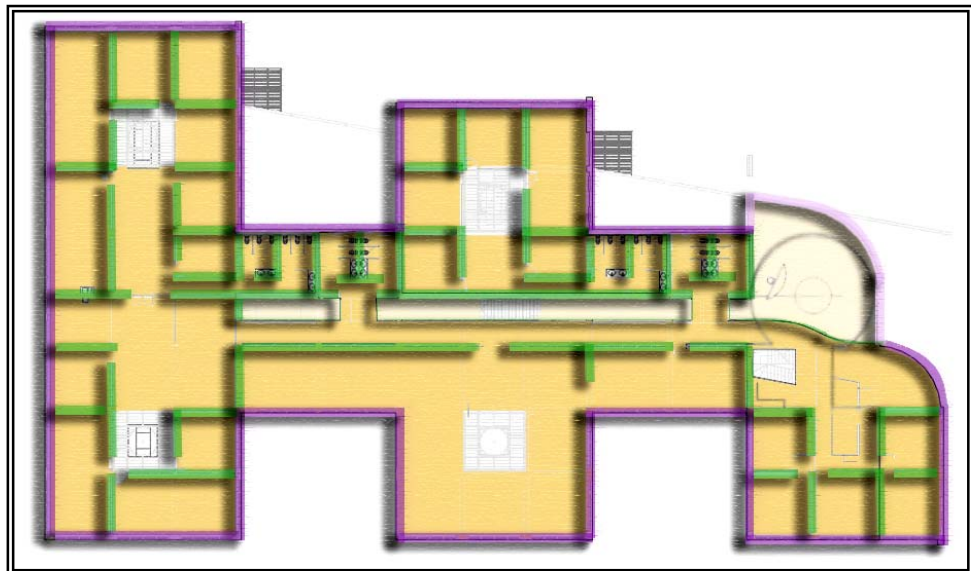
Adopted first floor plan of METU Halıcı Software House.
